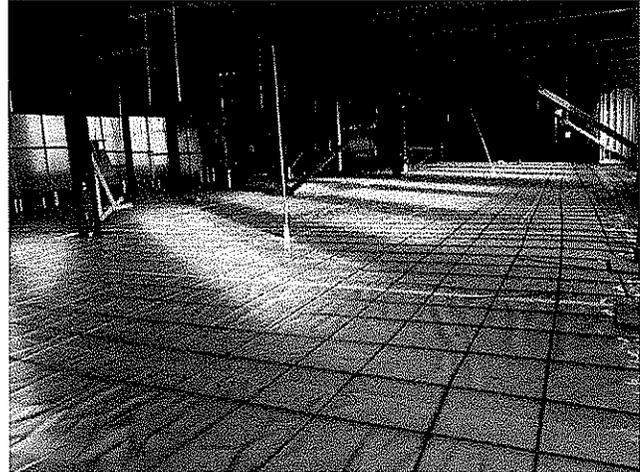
View northwest on the 1st floor of building segment F. January 20, 2011.
